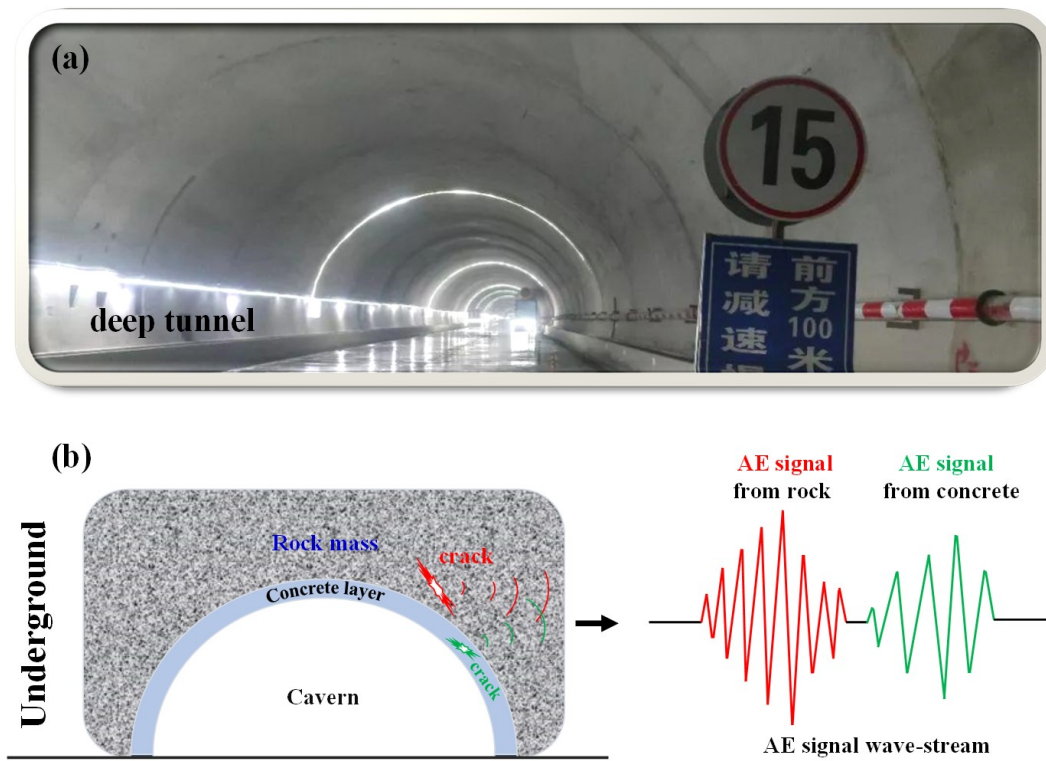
Rock-concrete composite structural schematic diagram. (a) Take developing tunnel as a typical case. (b) The mixing damage and corresponding AE wave-stream.
